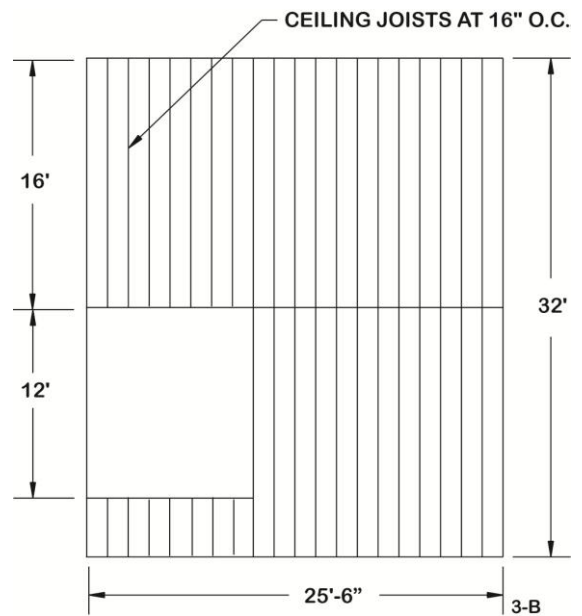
Roof and Ceiling Framing - Finished Attic Details
